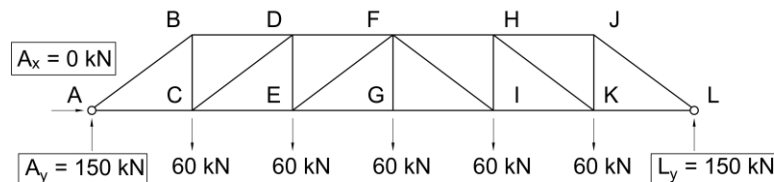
Truss structure with joint loads and solved reaction forces
